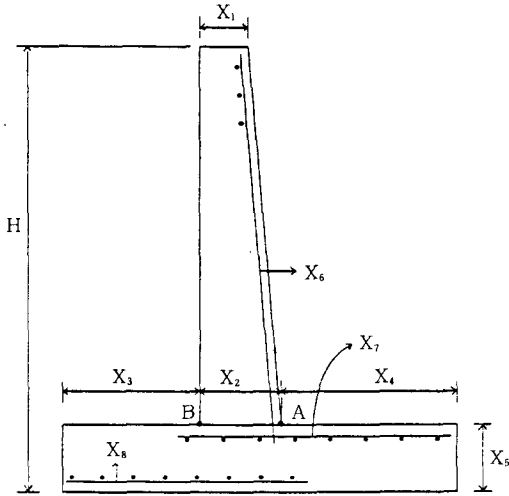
Cross Section of Cantilever Retaining Wall and Design Variables
